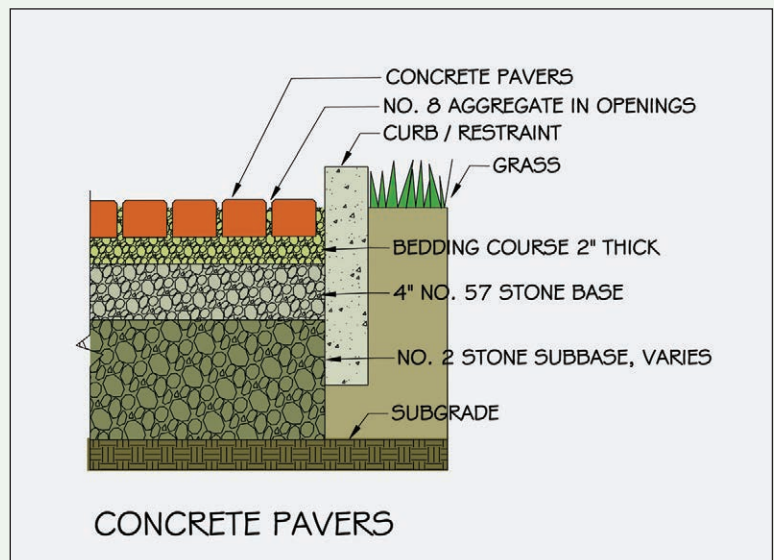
Permeable Concrete Pavers with typical underlayers. Refer to NY Stormwater Manual for specific underlayer guidance.
